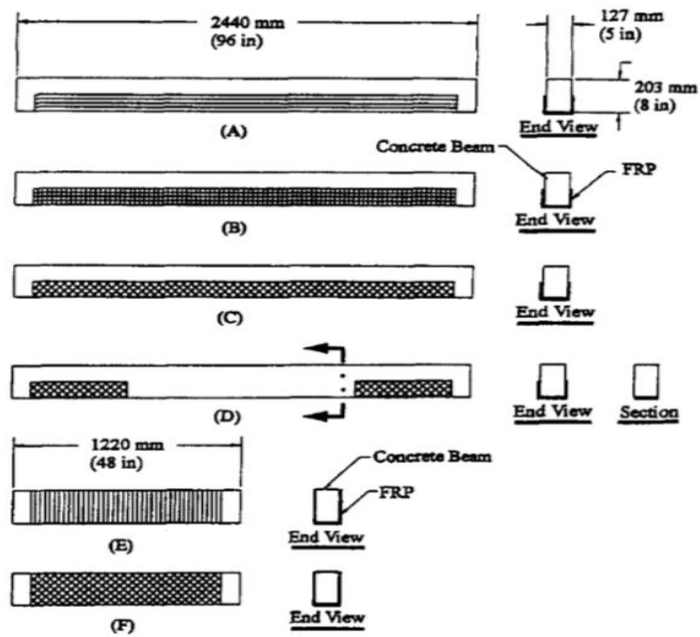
Fiber schemes for reinforced concrete beam specimens (Norris et al., 1997)
